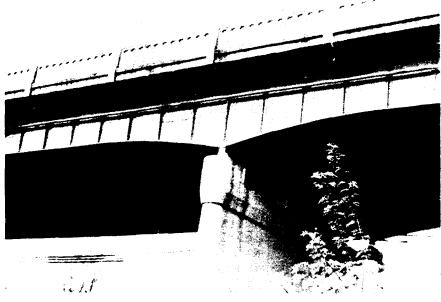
Web Stiffeners on a Fabricated Multi-Girder Bridge
